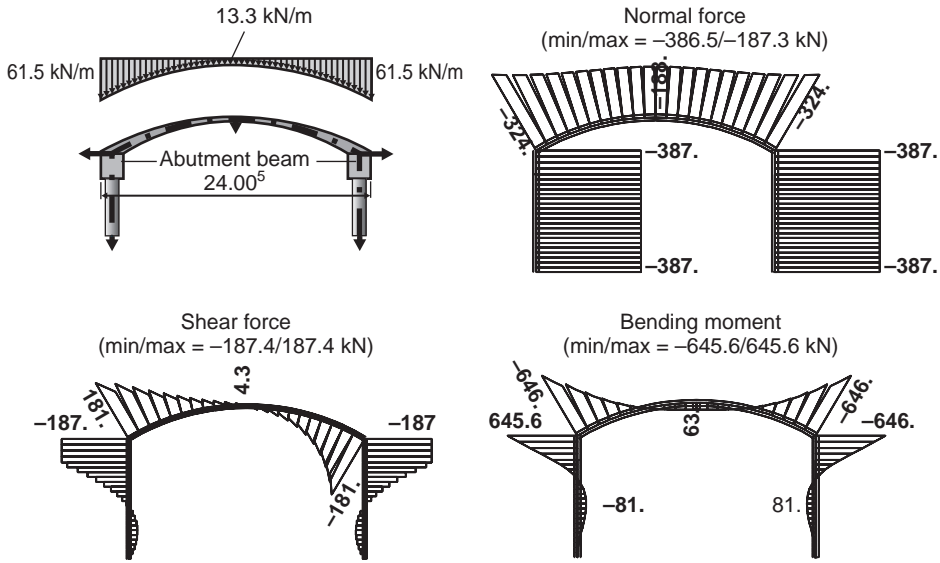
Portal frame bridge: structure, loading and member forces (truss model) due to ground surcharge
